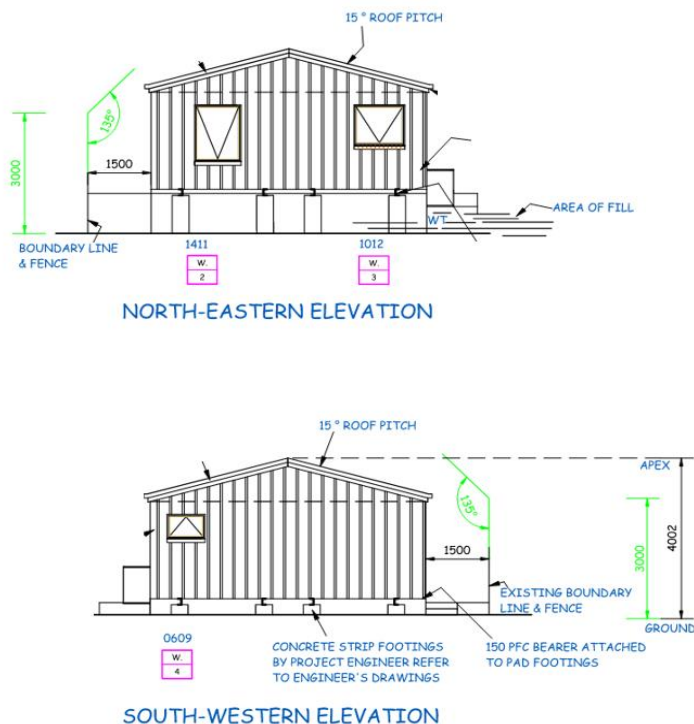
Elevation plans showing the north-eastern and south-western elevation of the proposed development.
